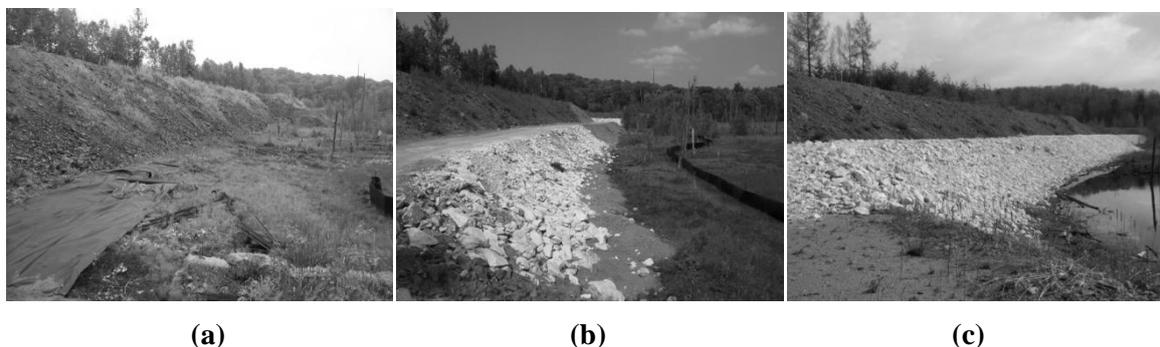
Toe berm construction: (a) foundation; (b) internal zones; (c) completed toe berm
